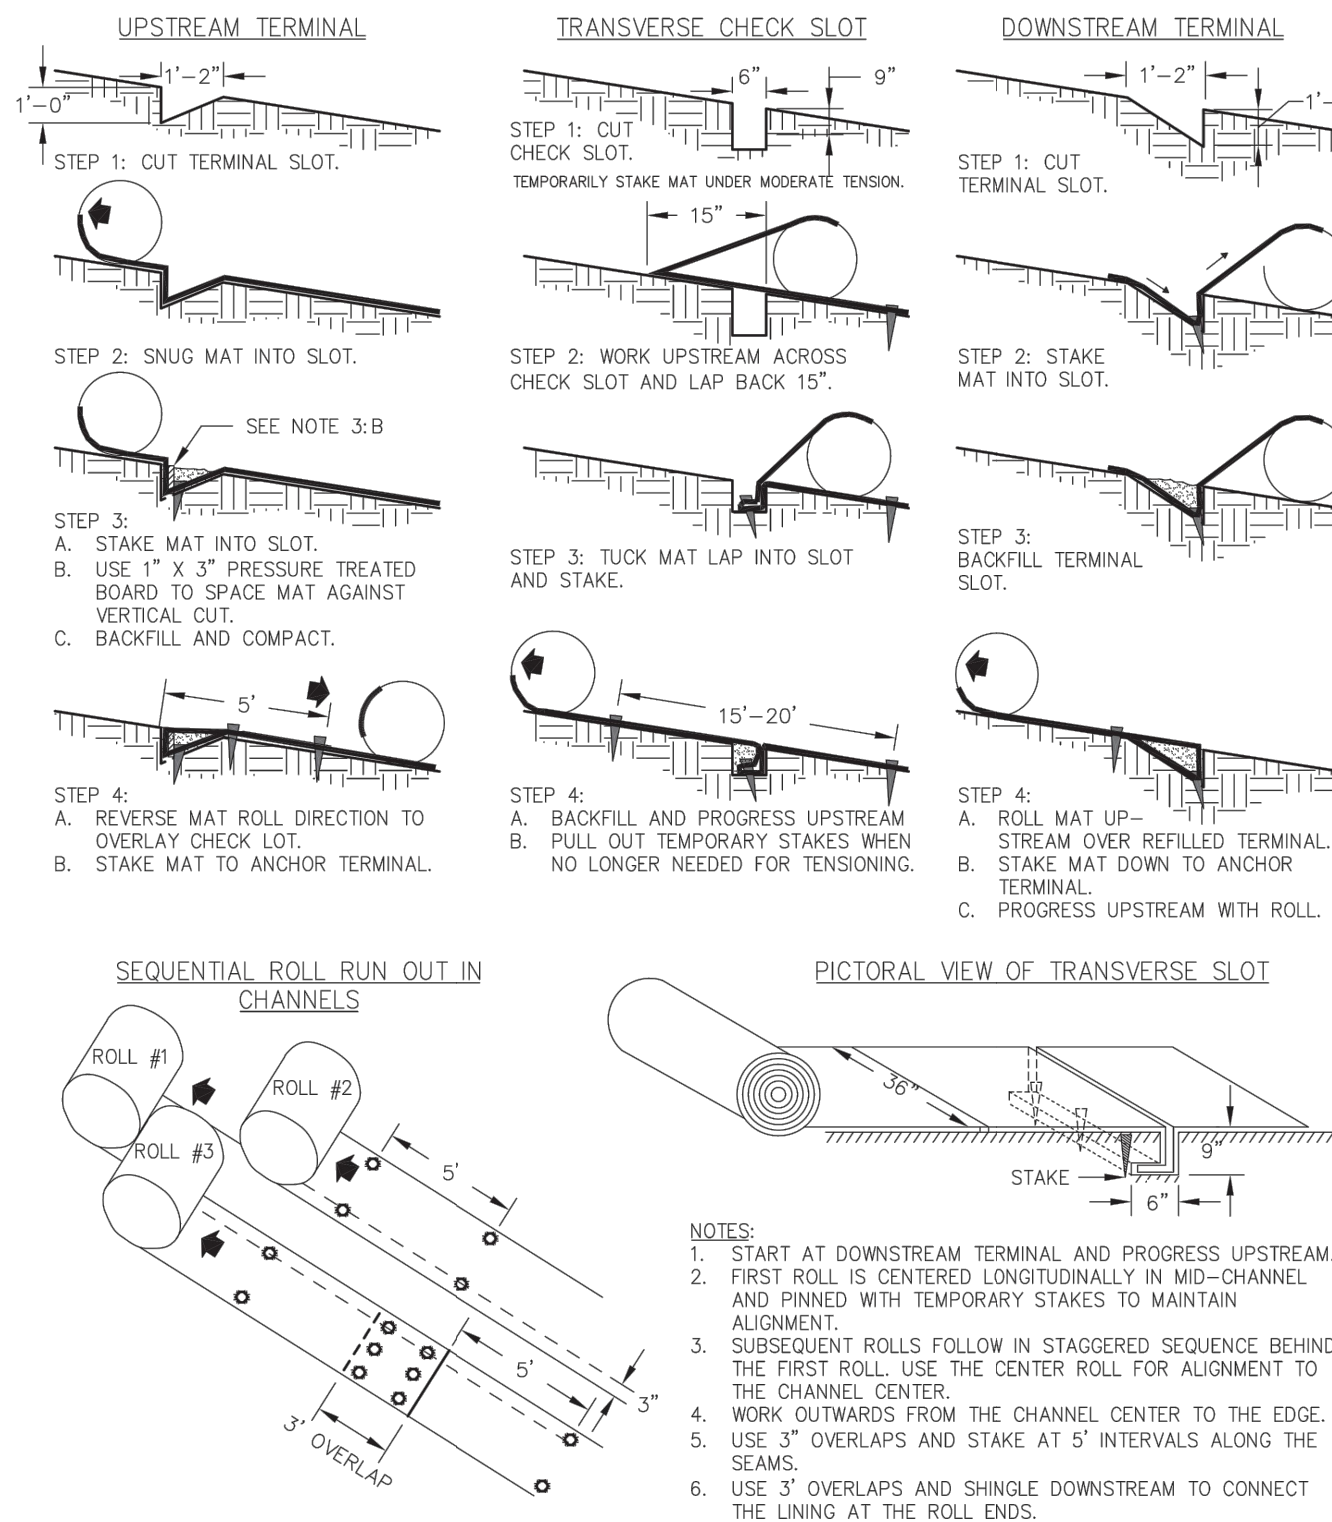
Typical Installation Guidelines for Matting and Blankets
